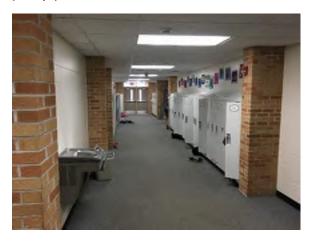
Sheet carpet flooring installed in main hallway in 1999 addition. Flooring is in fair condition, consider replacement as this is a high traffic area with something more durable.
